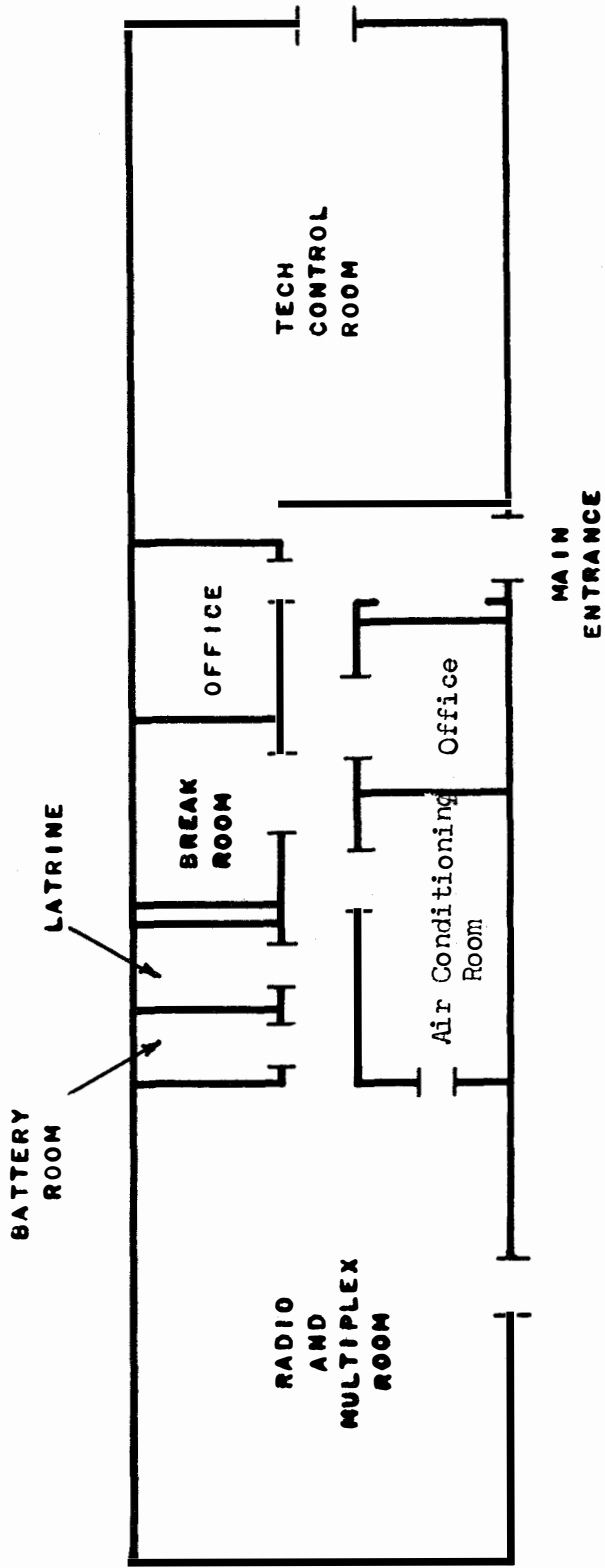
TYPICAL ELECTRONIC EQUIPMENT BUILDING
